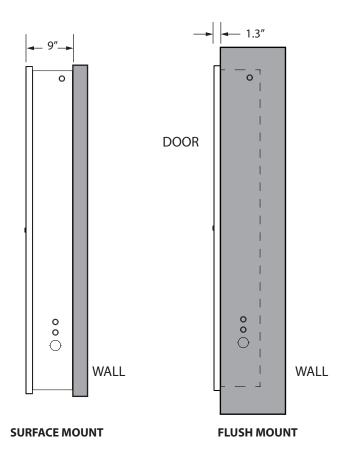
Surface and Flush Mounting Views of the MMX-MNSXP(R)
